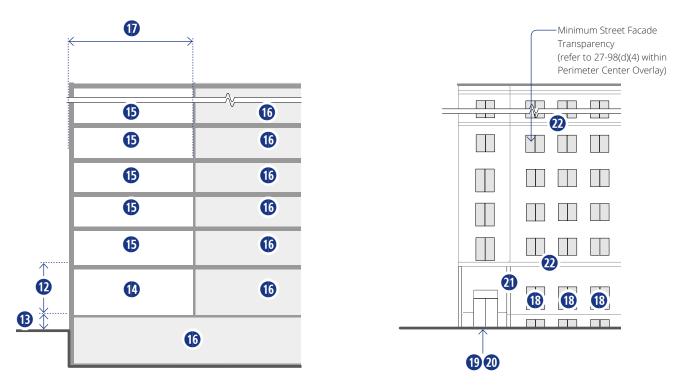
General Building: Floor-to-Floor Height & Use Requirements
